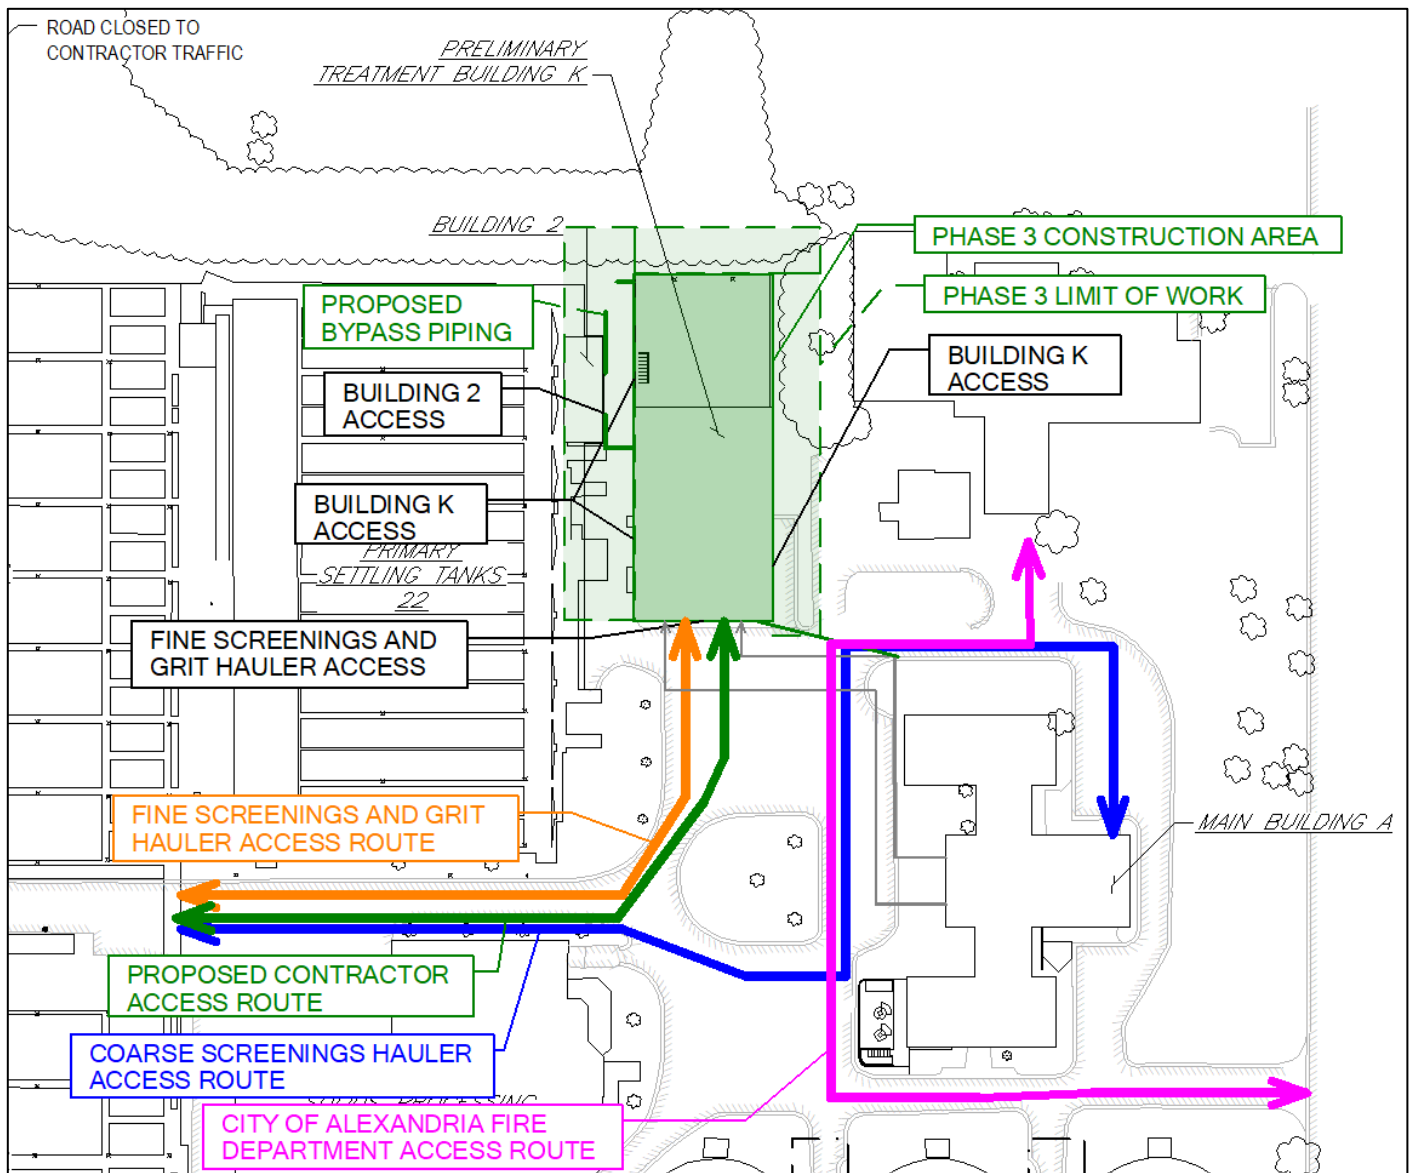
Partial Site Plan of Phase 3 Construction Impacts
